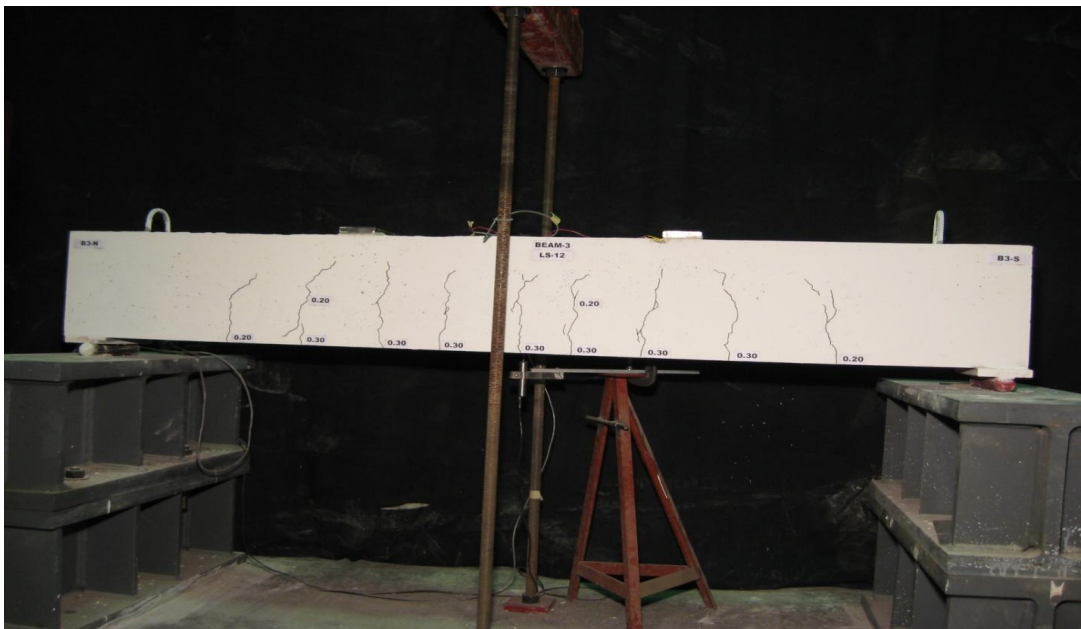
Cracking pattern for beam 3 at a load of 99.78 kN (B3-LS12)
